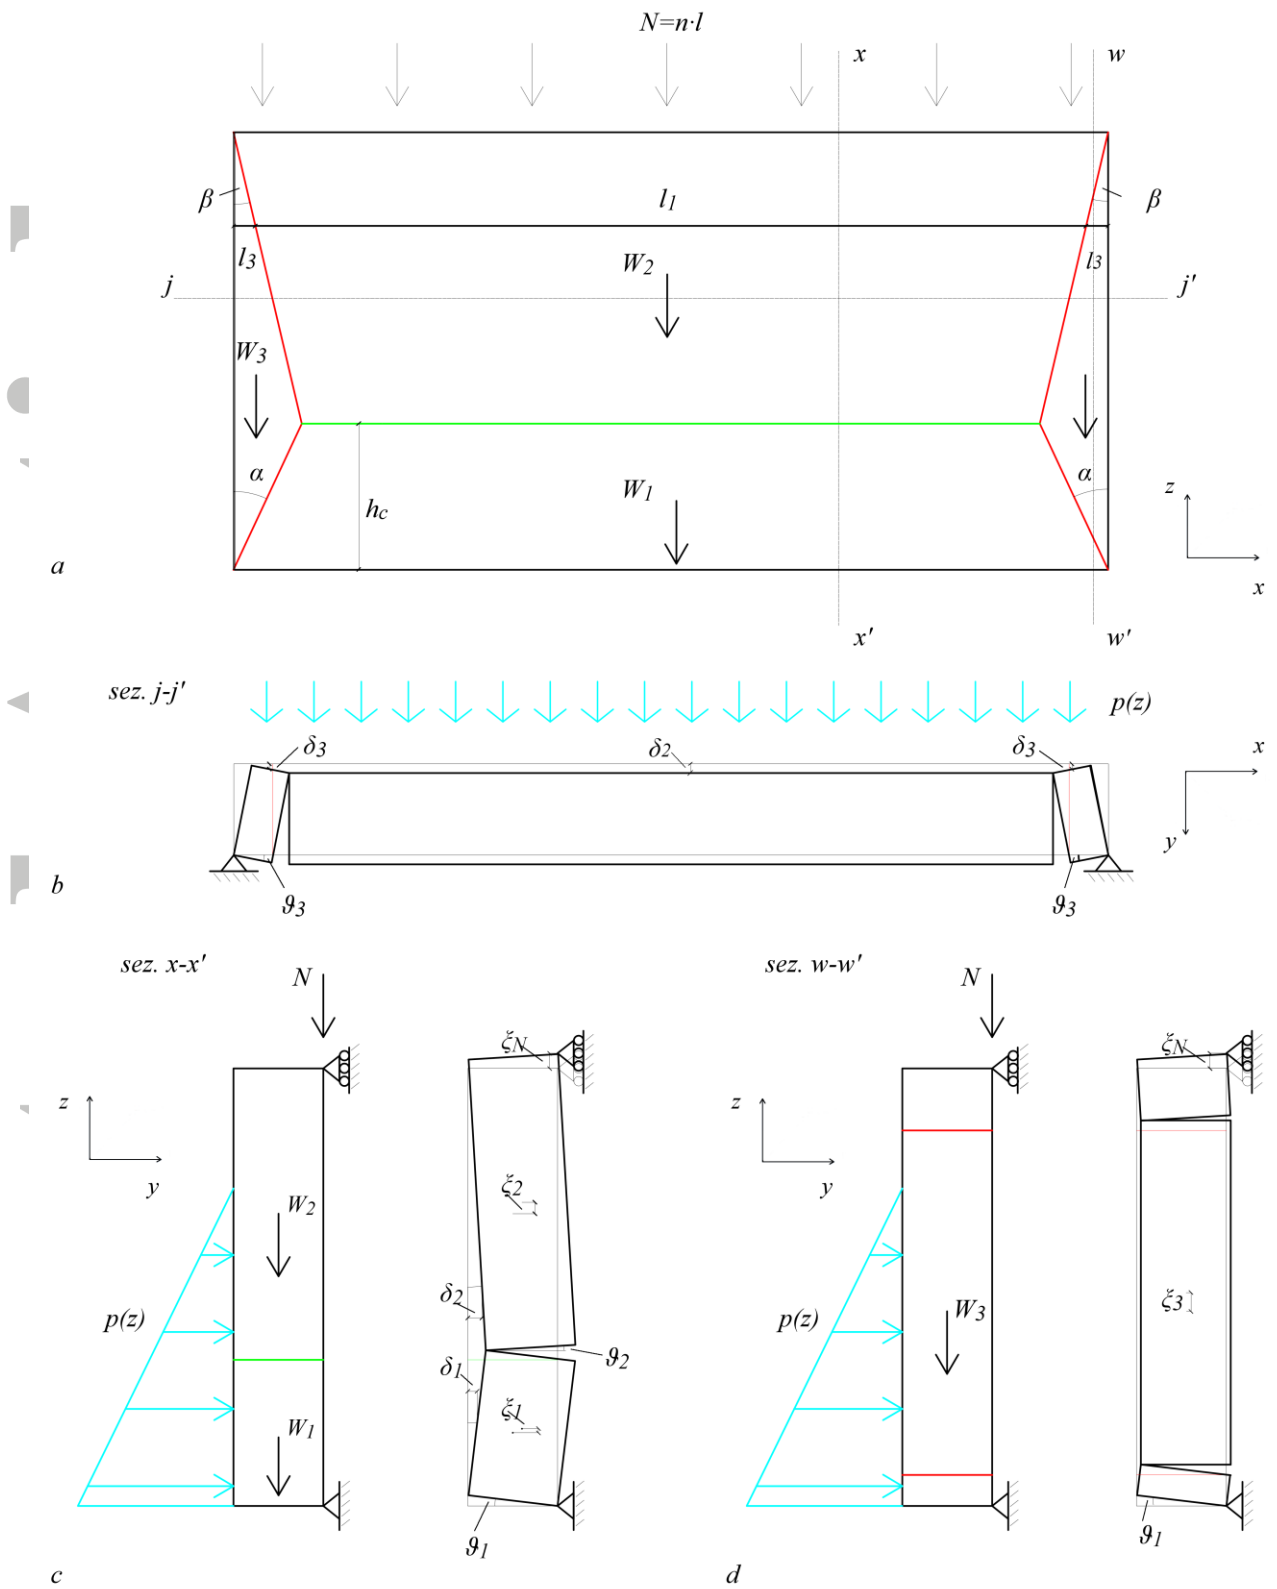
Reference wall P4 (4-edges support) collapse mechanism. Front view (a), plan cross section (b) and vertical cross sections (c, d).
